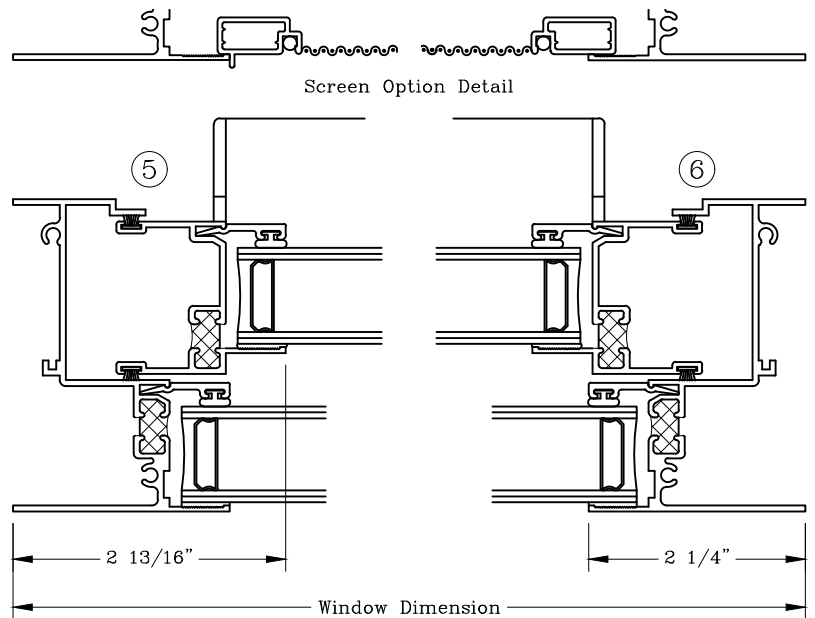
/2 Scale - For Custom Size Drawing Contact Graham
